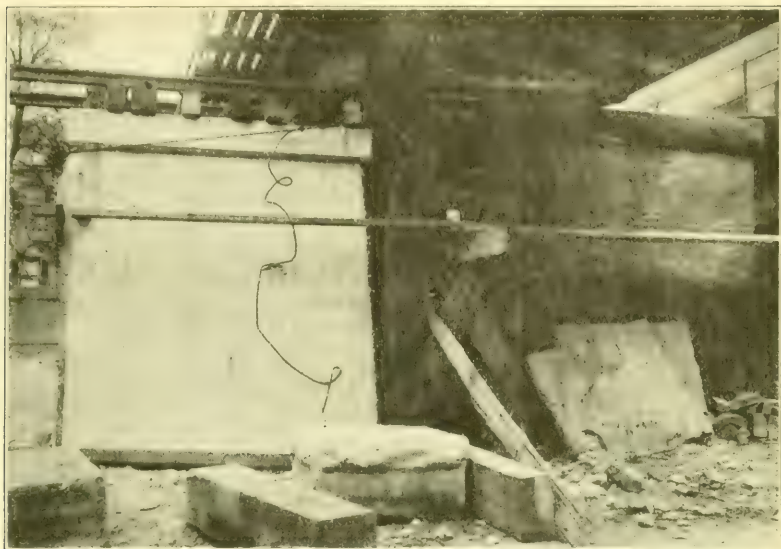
SHIFTING APPARATUS ON PIER 75.
